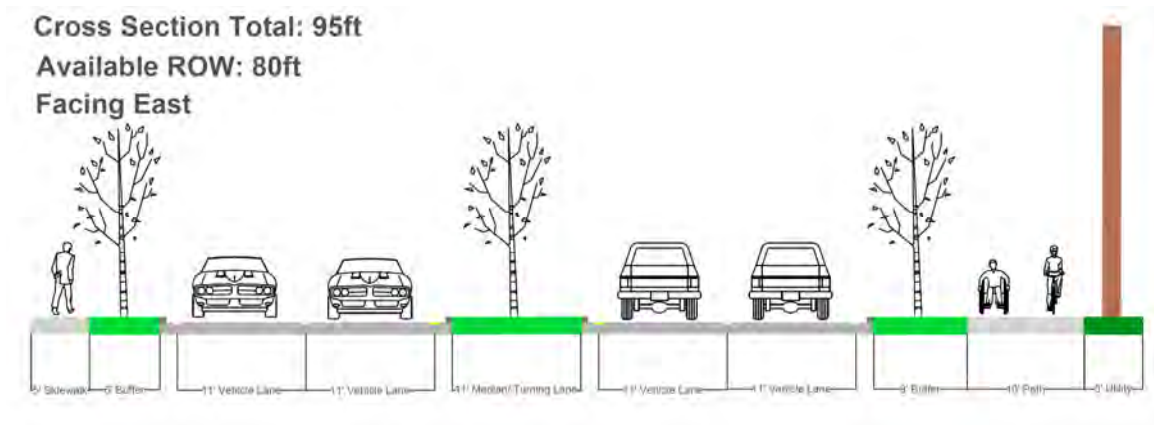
ROUTE 28 CENTERVILLE CROSS-SECTION - OPTION 2D
